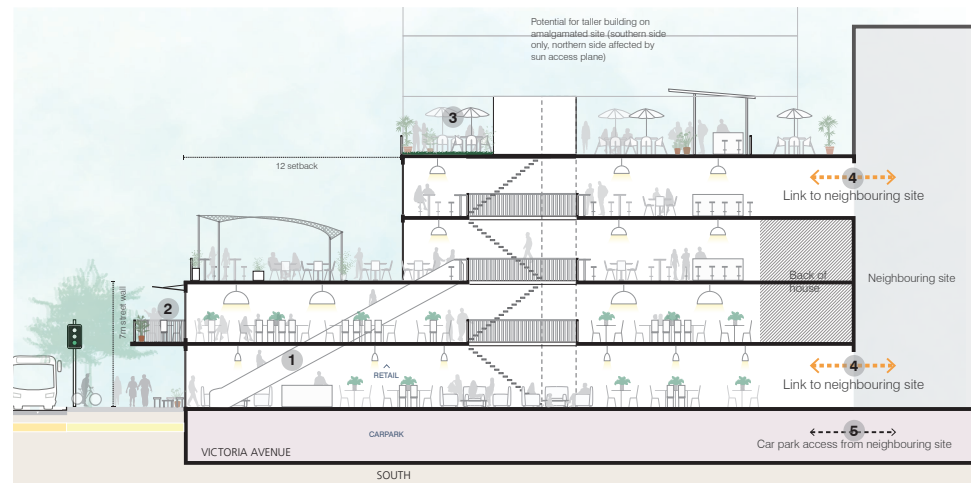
Section of Victoria Avenue shops concept (facing east)
